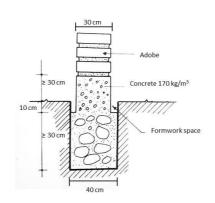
Required measures for strip foundations of adobe houses (Barrios, 1989)
